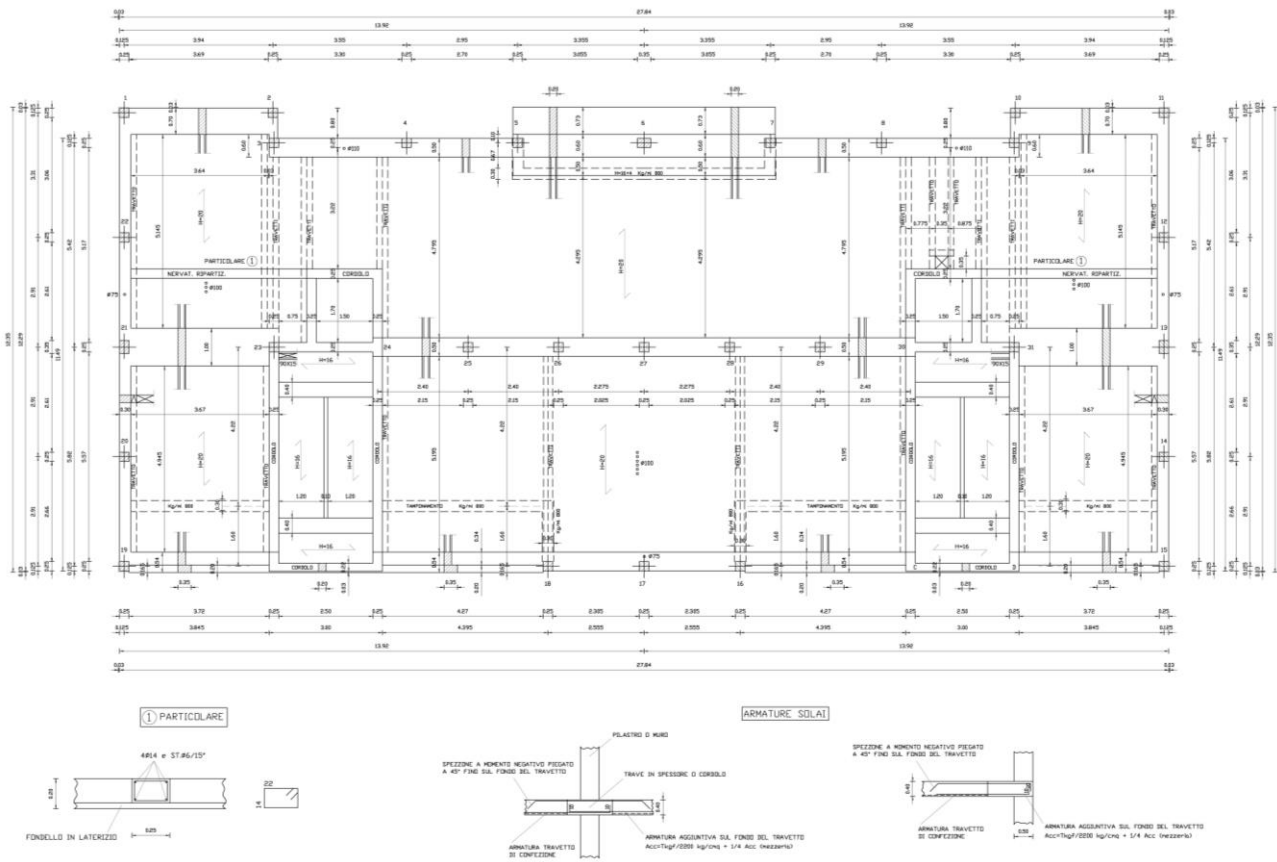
Technical drawings of the structure of the typical floor – Source: [151]
